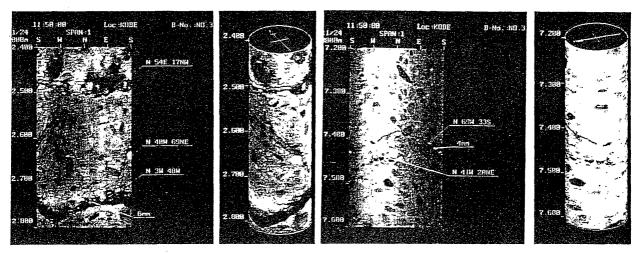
Cracking in a Drilled Shaft Identified by Borehole Camera
